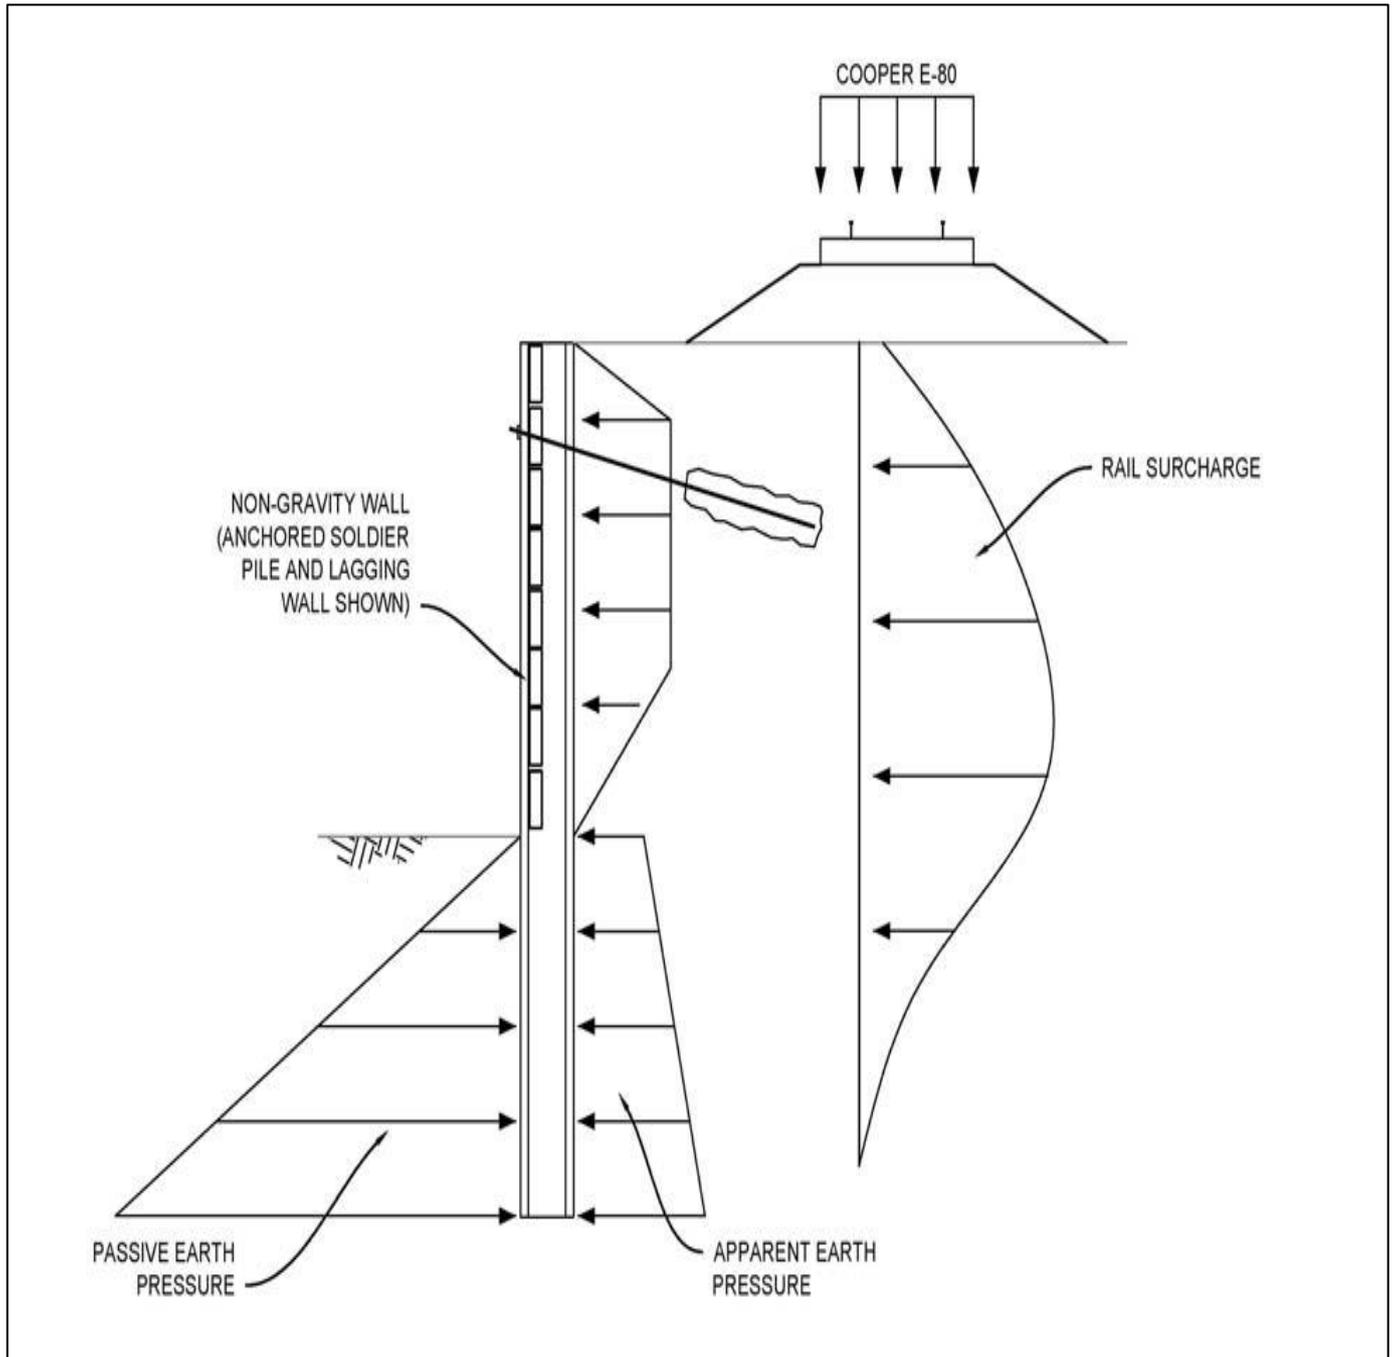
Non-Gravity Retaining Wall Schematic Bryan Duevel et al (2014)
